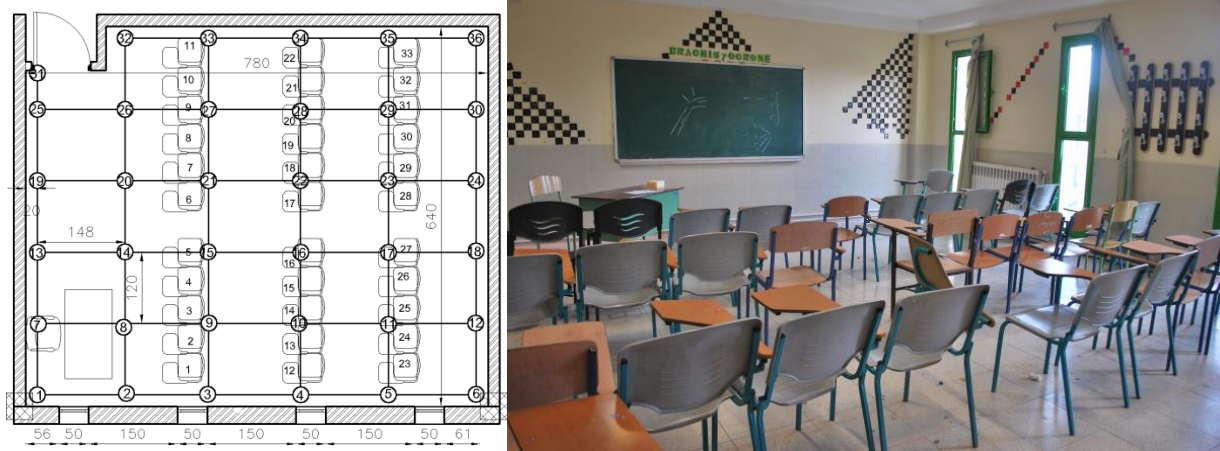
Left, grid of (1.2*1.4 m) 36 points in south facing classroom. Fig4. Right, studied north facing classroom in first floor of the school.
